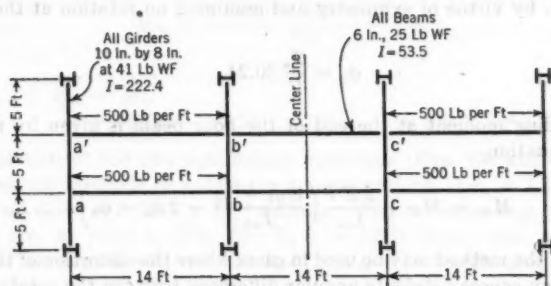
FLOOR FRAMING PLAN FOR EXAMPLE 3
